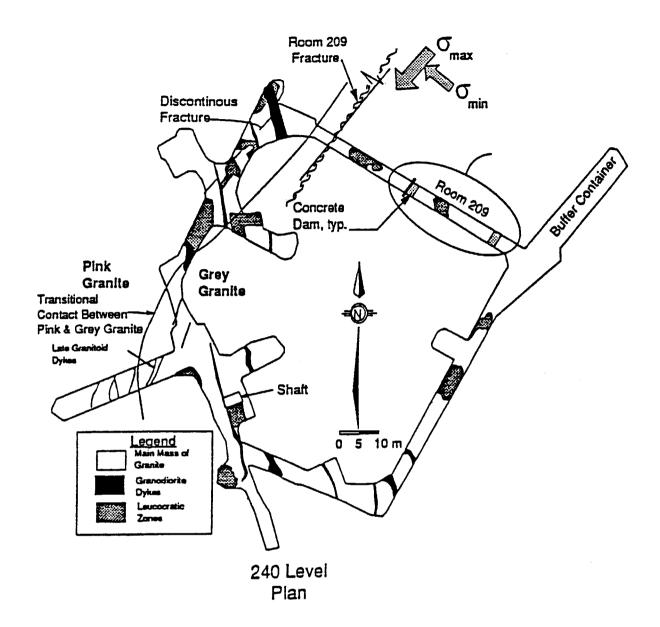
Plan view of 240 level in the URL showing location of vertical joint zone JZ2
